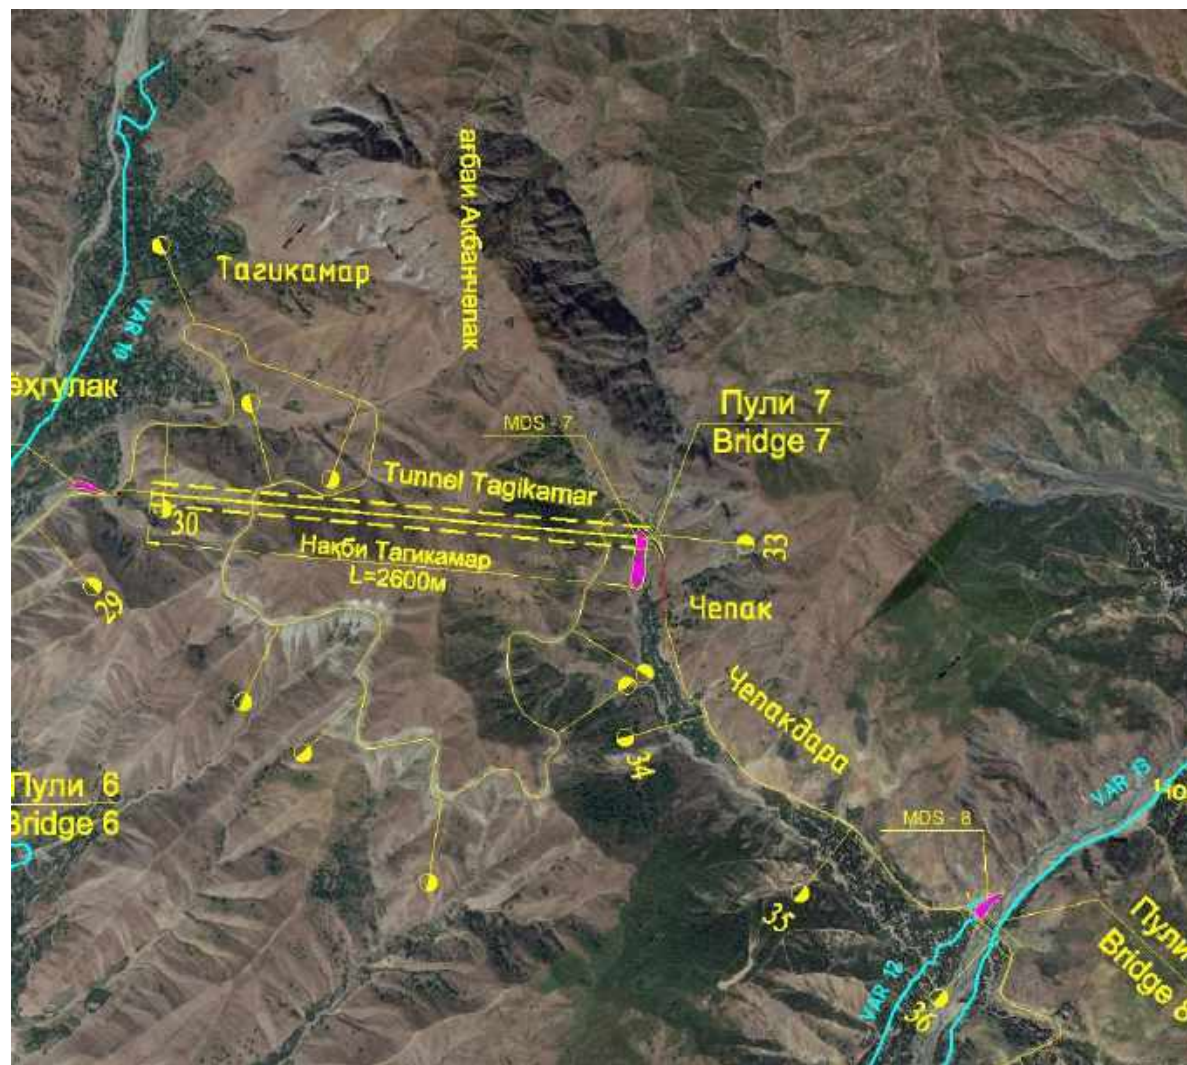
Spoil Disposal Sites (MDS7 to MDS8) Tunnel 3 east 1/4
